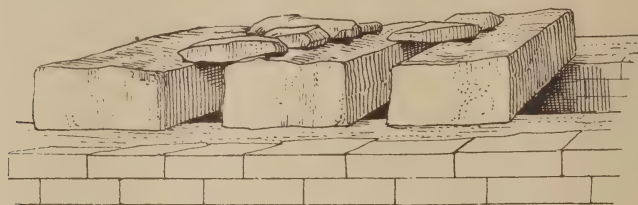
USE (APPARENT) OF STONE FOR BRIDGING SPACES BETWEEN CEILING STONES.
